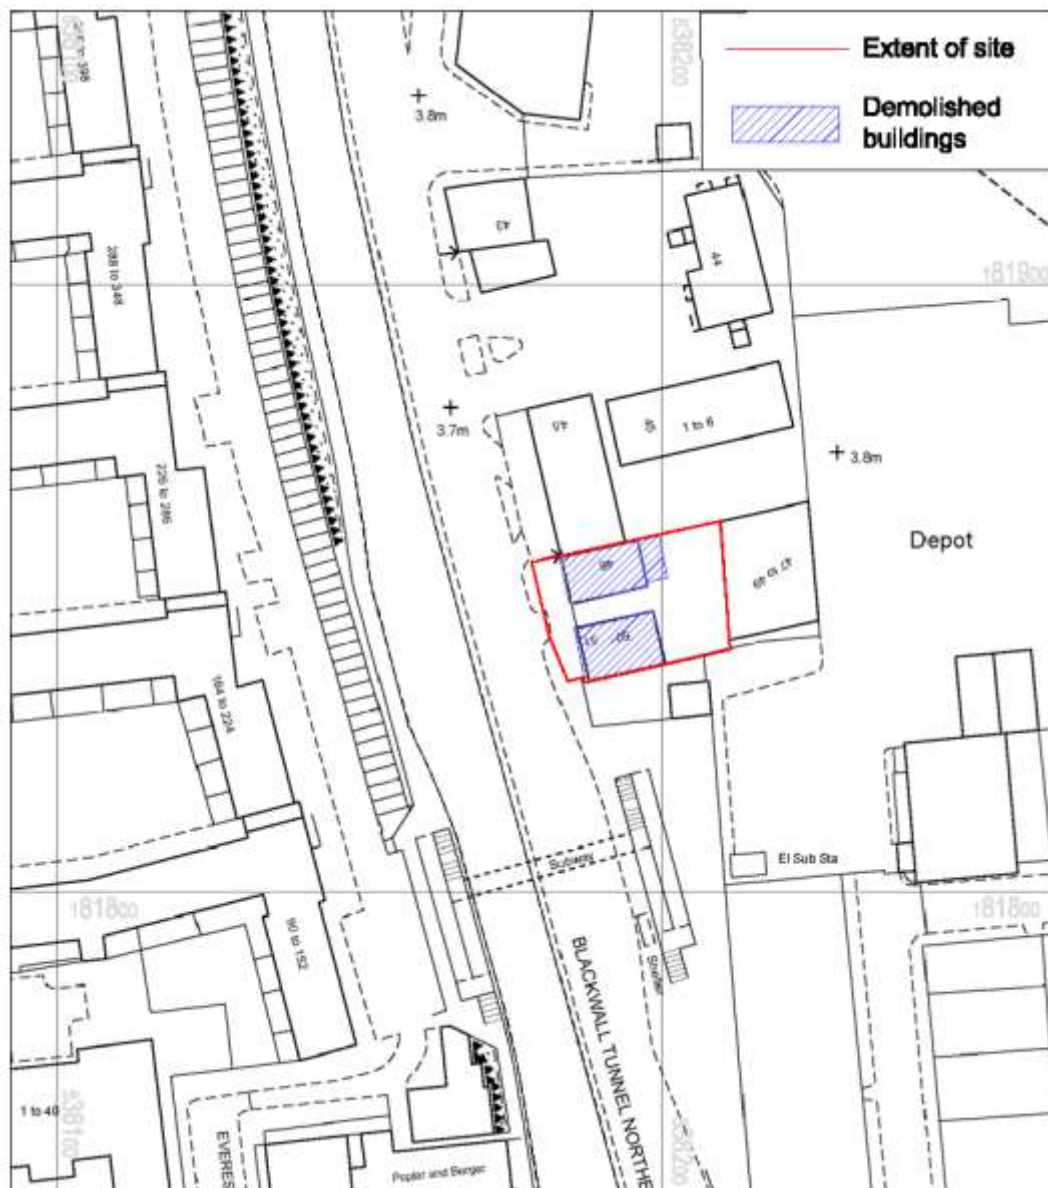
Site plan showing demolished buildings (Scale 1:1250)
